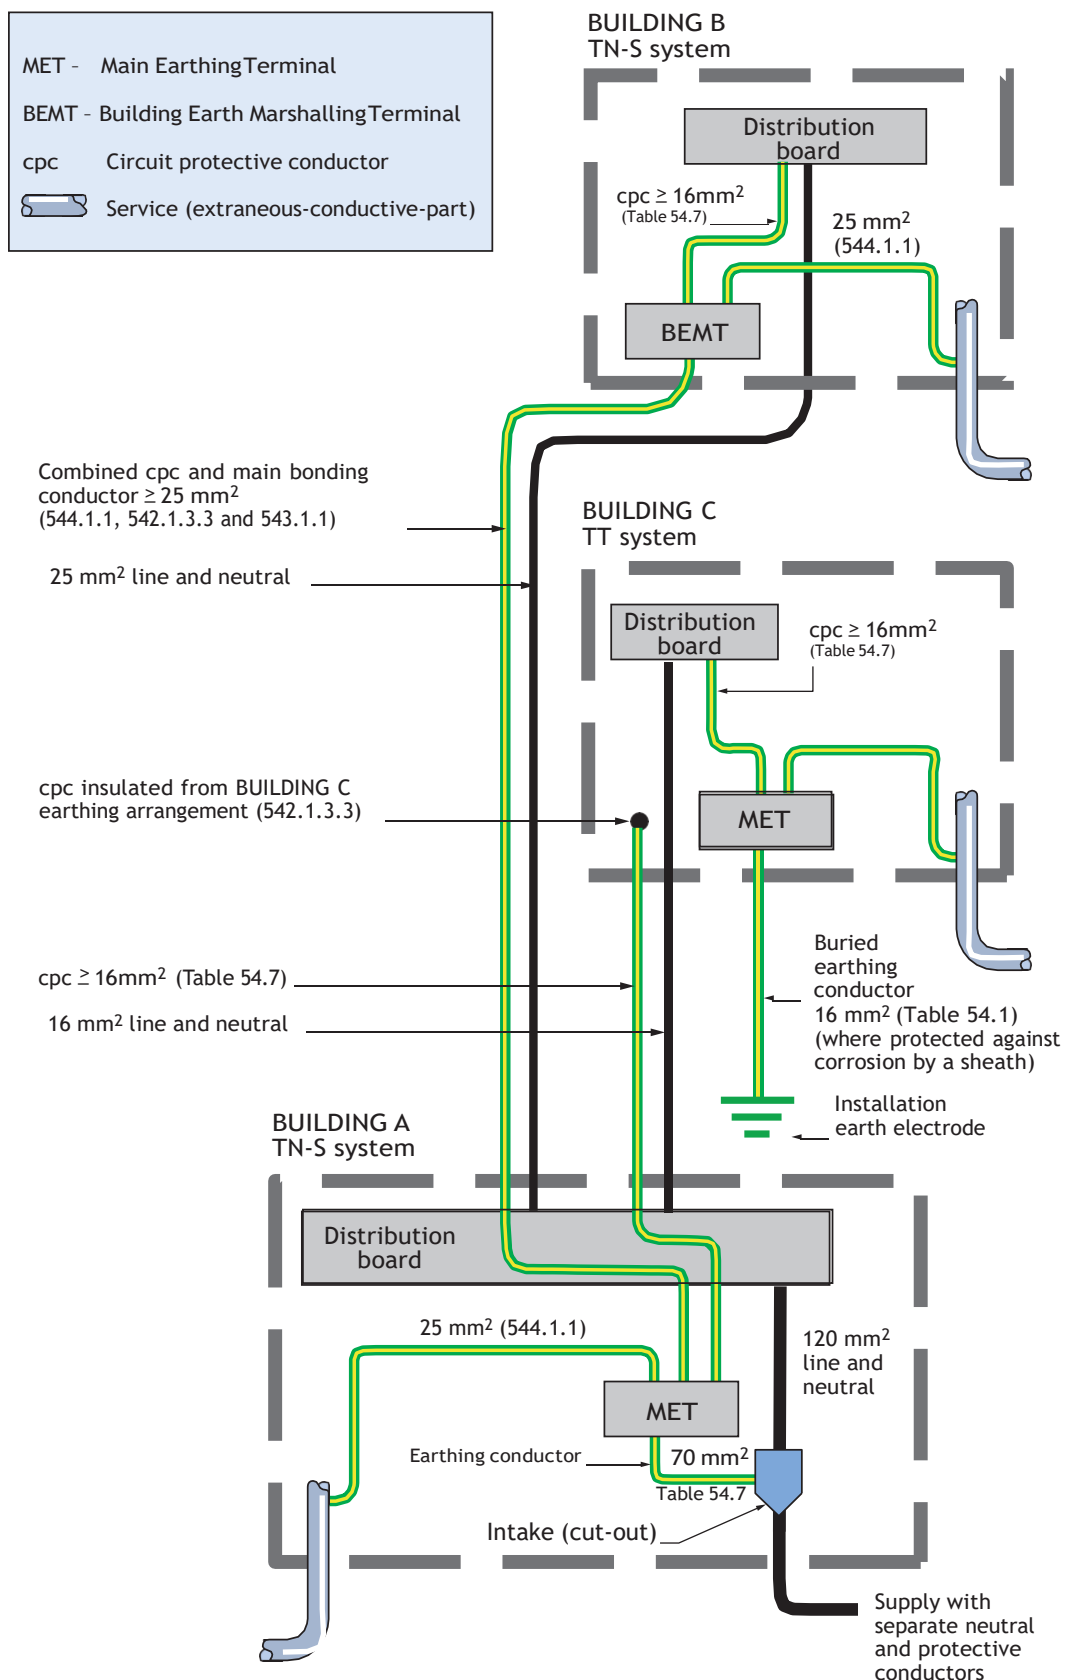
An example of the application of Regulation 411.3.1.2 where an installation forming part of a TN-S system serves more than one building
